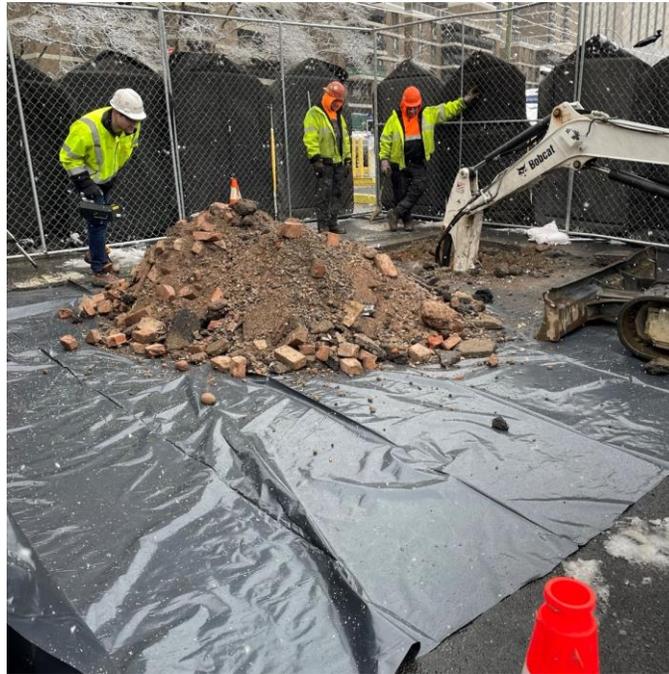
View of AARCO excavating test pit TP04 and stockpiling excavated soil/fill on polyethylene sheeting (facing north).
